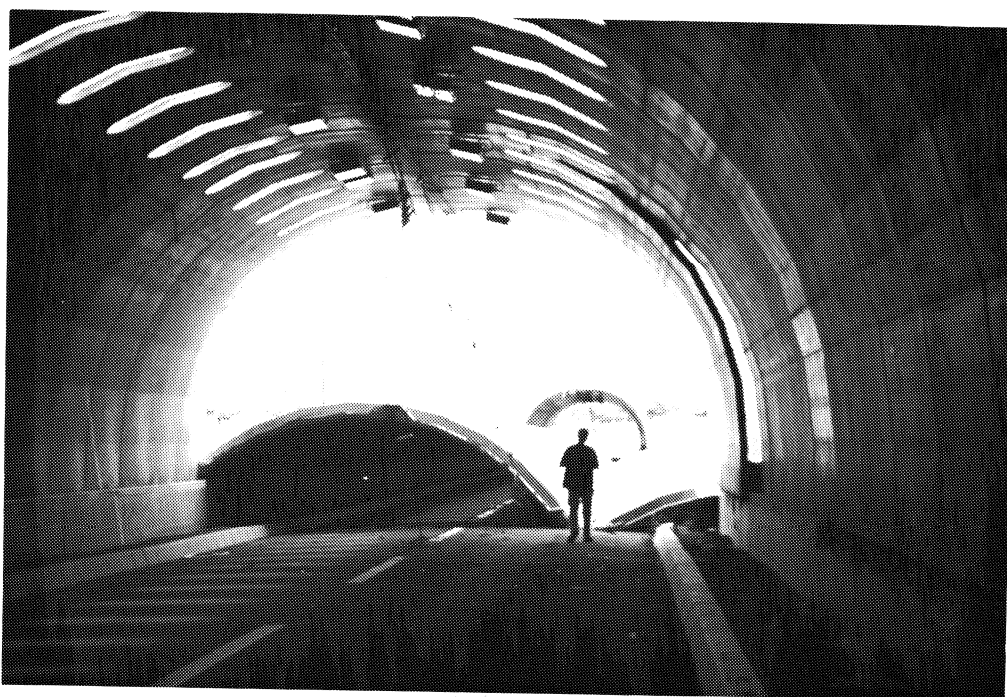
Although the arch has collapsed and dropped the precast planks onto the pavement, the planks are relatively undamaged, testifying to the general quality of construction of the superstructure.
